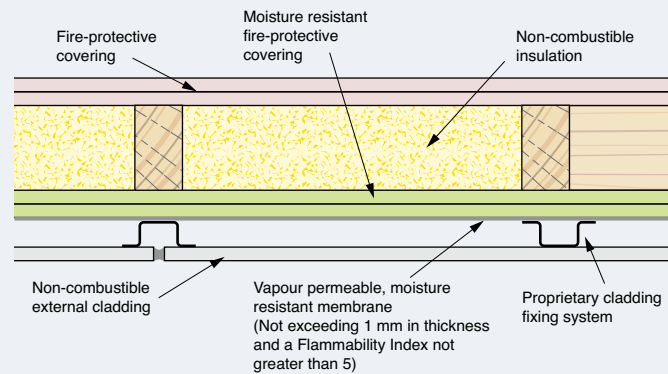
Fire-protected timber frame external walls with lightweight cladding.
